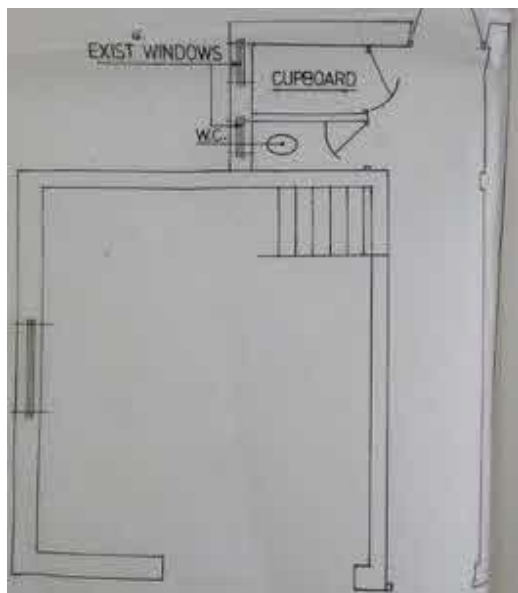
(left): Existing ground floor of garage/Flat 90B – 1968-70s.
